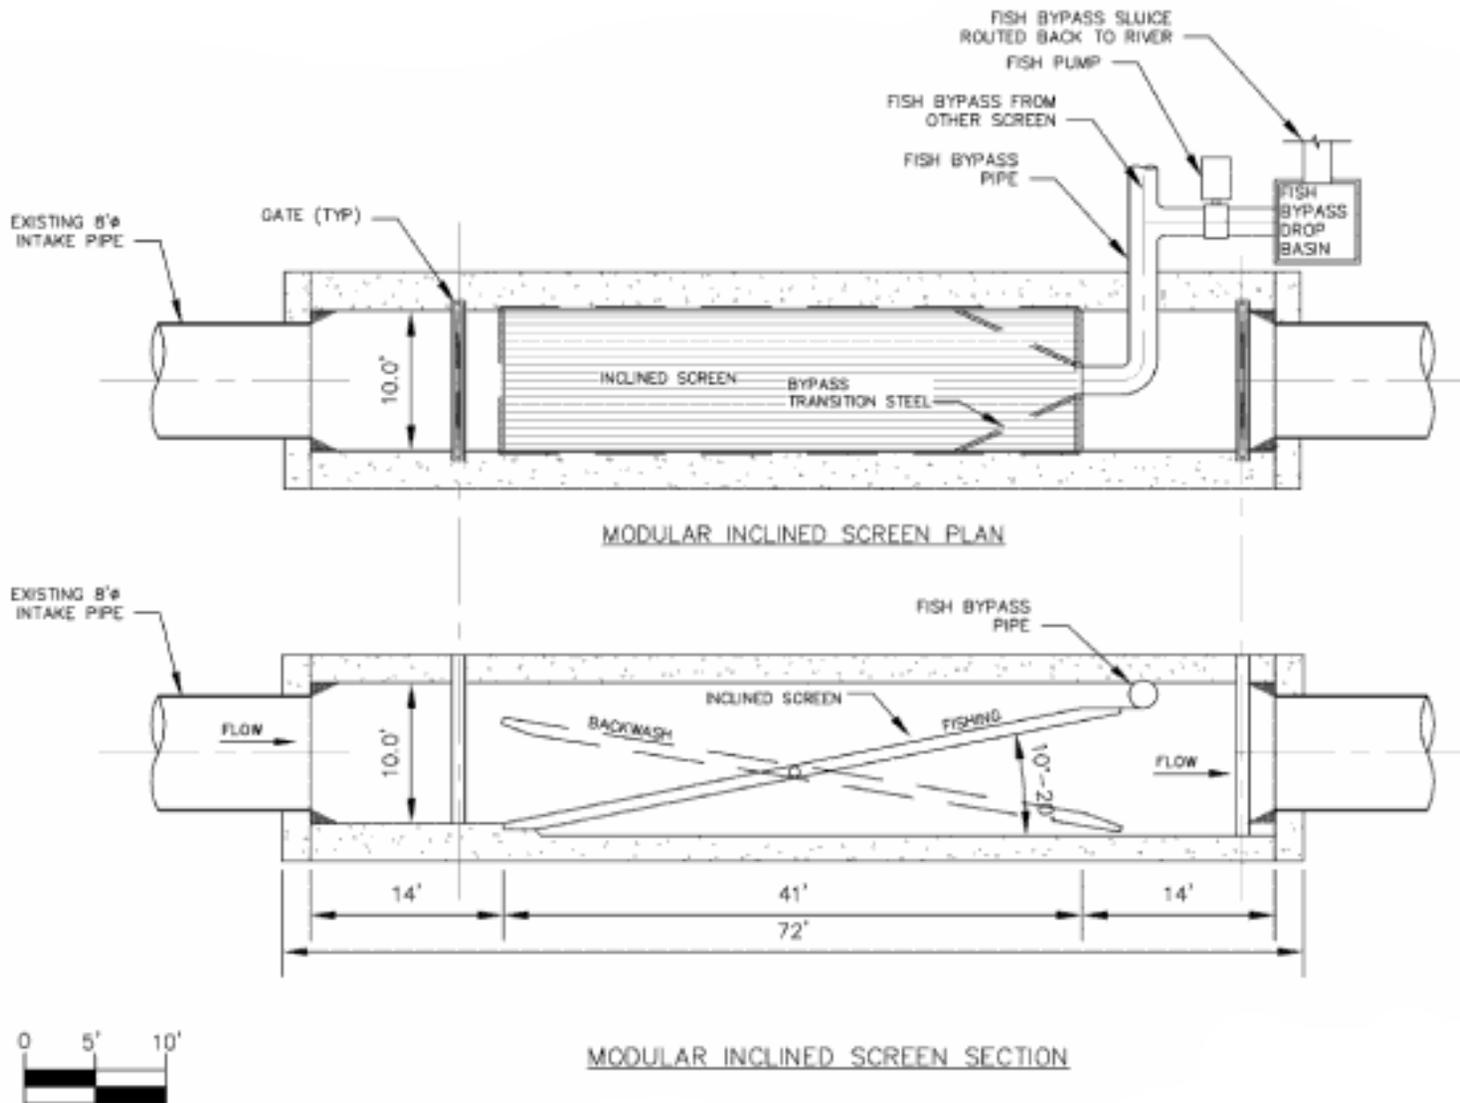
Modular Inclined Screen — Typical Plan and Section
